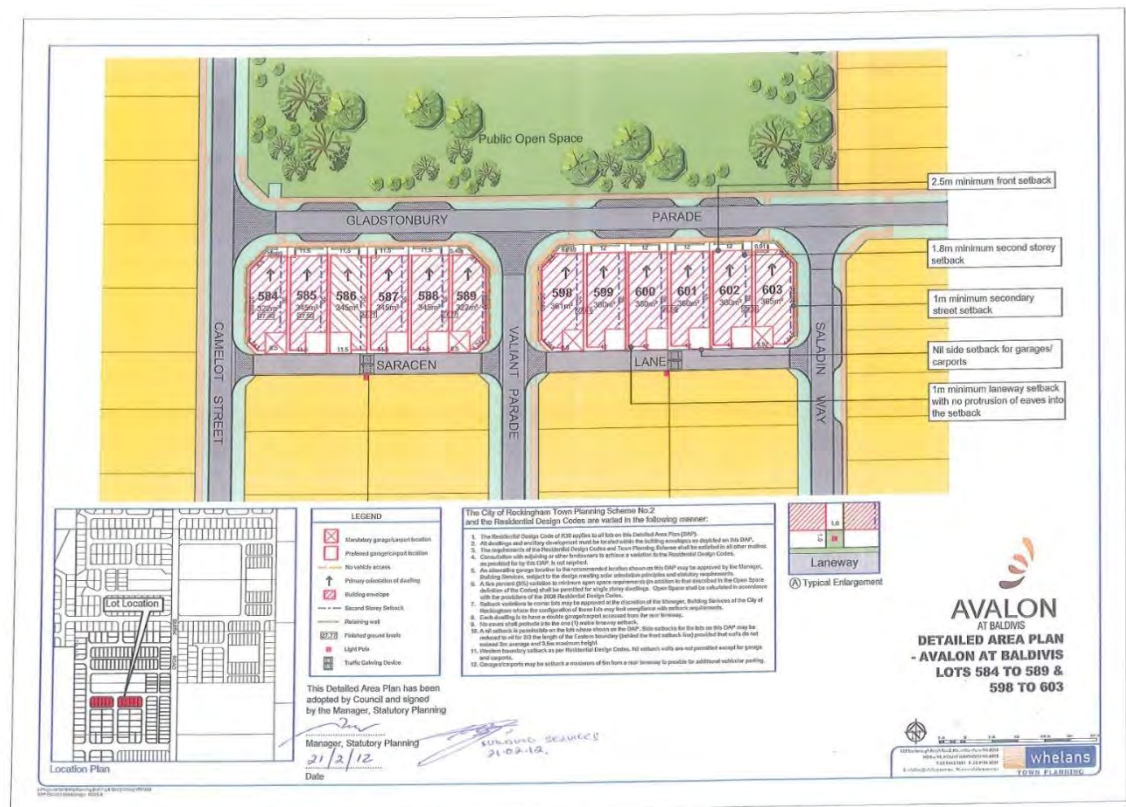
An example of Livable Neighbourhoods of Detailed Area Plans
